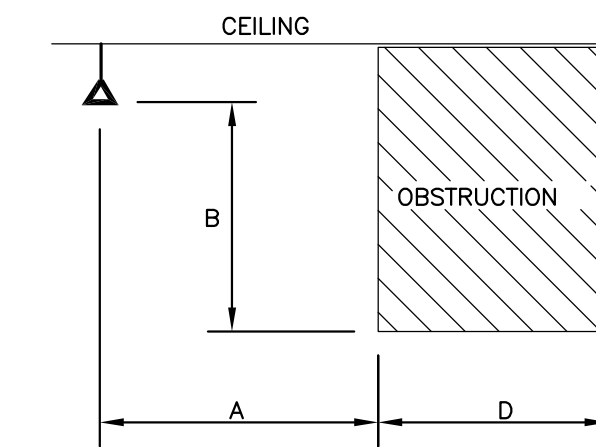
(b) OBSTRUCTIONS AGAINST WALLS (SSU/SSP).
